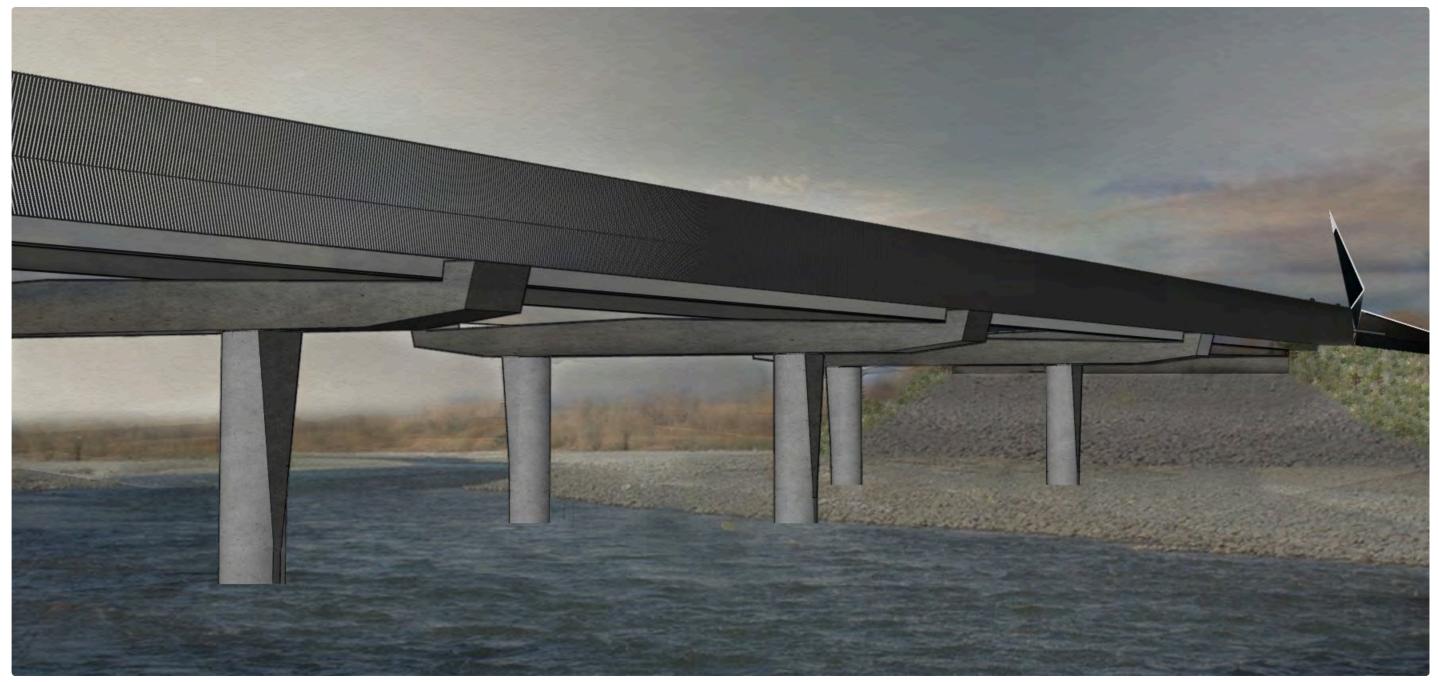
Ōtaki River Bridge piers - Illustrative only (Note: accessways under bridge have not been shown in this image).
